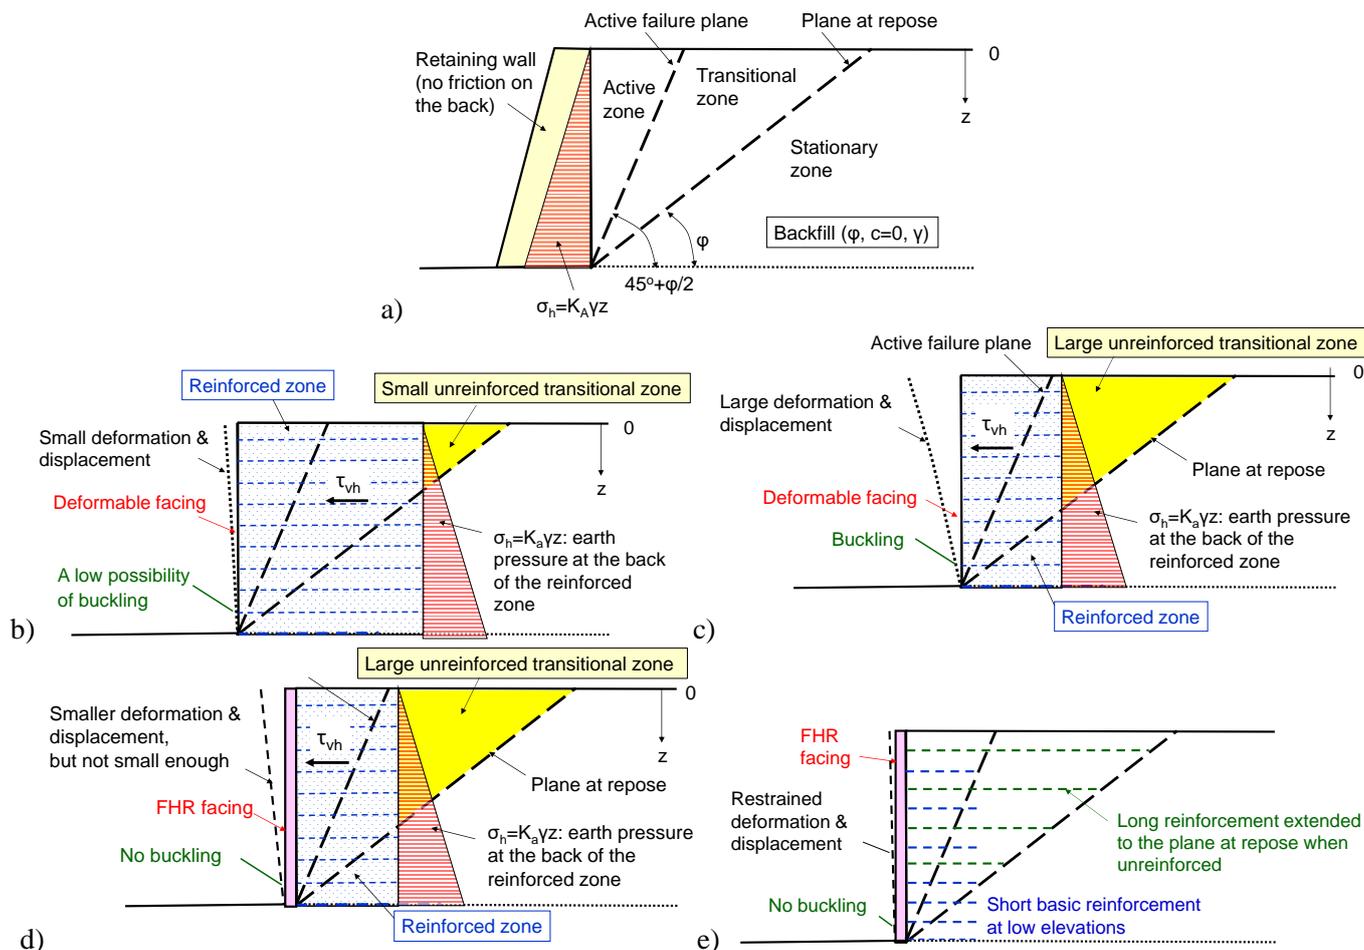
Active failure mechanism: a) conventional cantilever RW; and reinforced soil RWs with: b) flexible facing & long reinforcement; c) flexible facing & short reinforcement; d) FHR facing & short reinforcement; and d) FHR facing & several long reinforcement layers and short reinforcement layers at low elevations.
